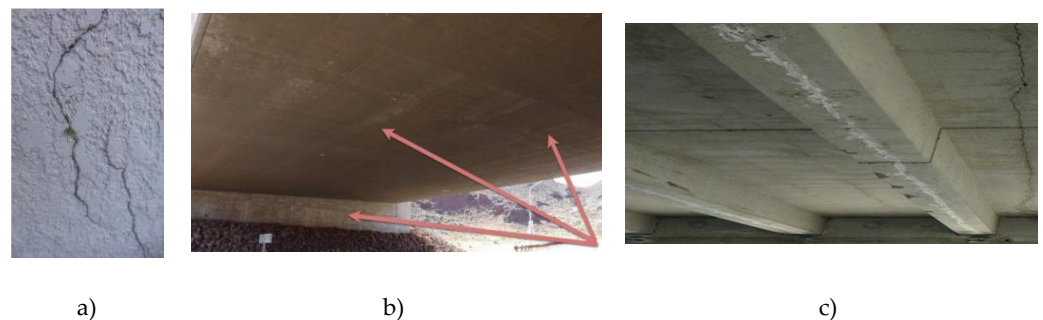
Examples of cracks in concrete: a) Typical micro-cracking; b) Conventional inspection of bridge cracks; c) Cracks along a slab in a mall.
